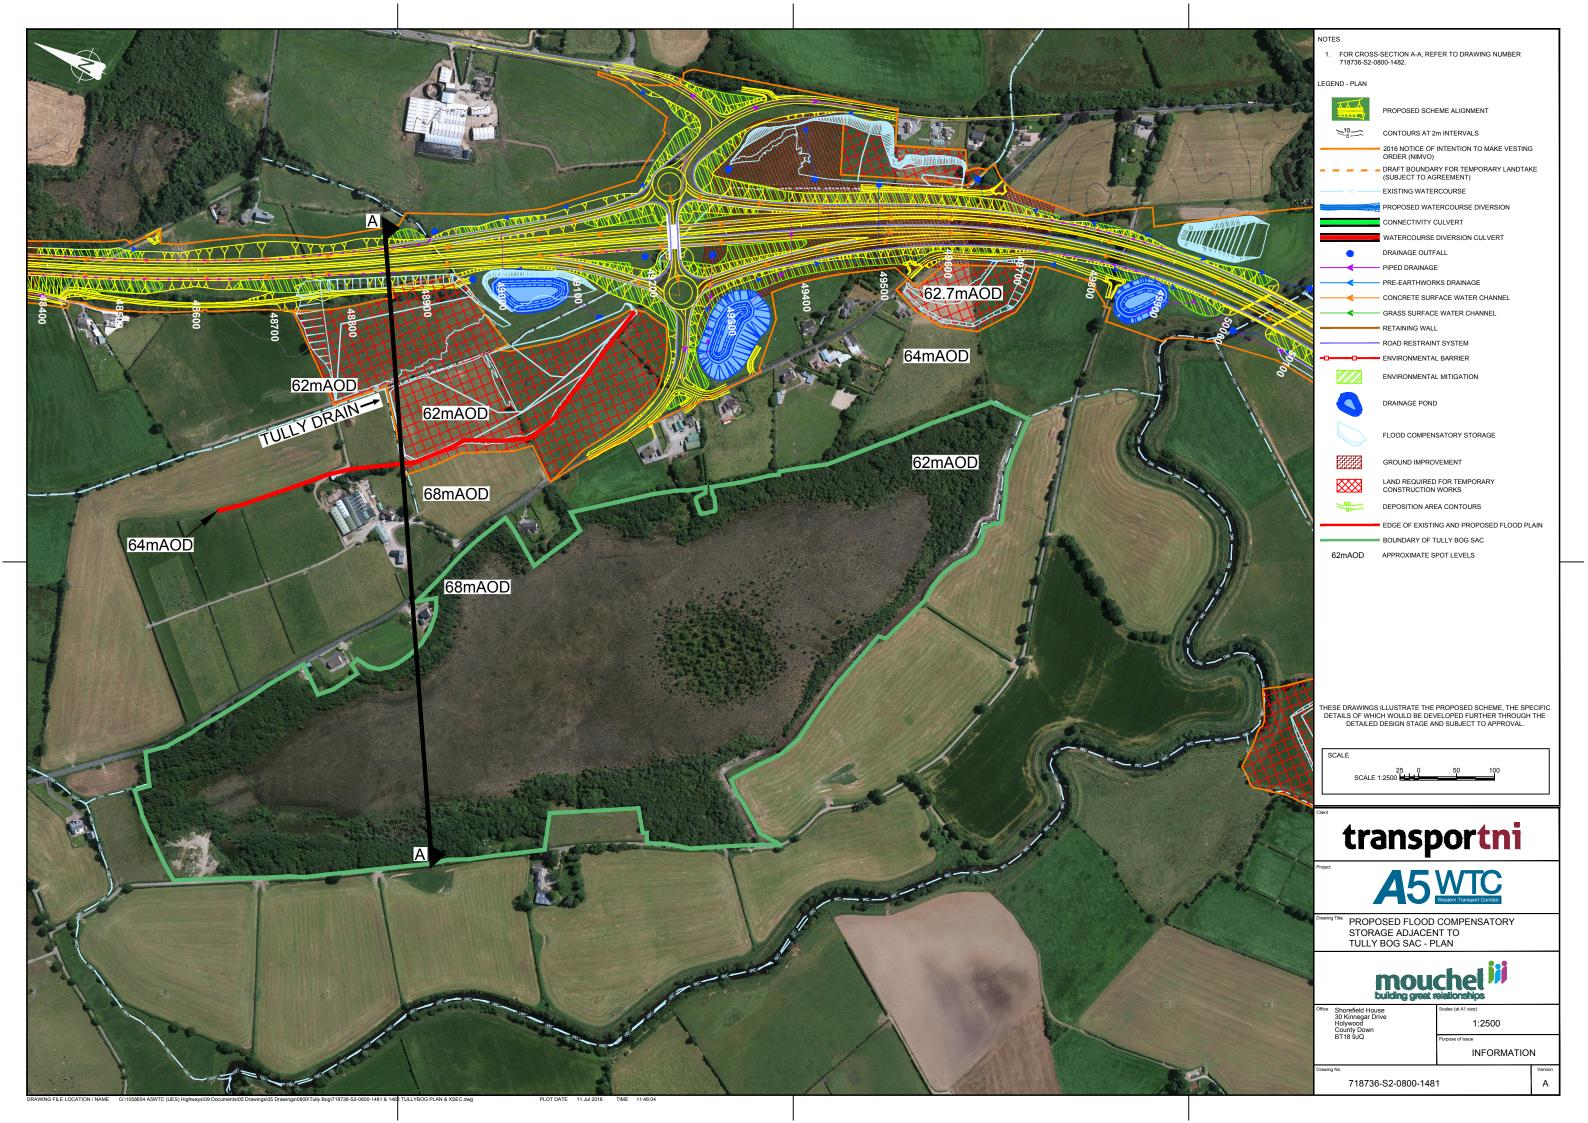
S2-0800-1483: Proposed Flood Compensatory Storage adjacent to Tully
